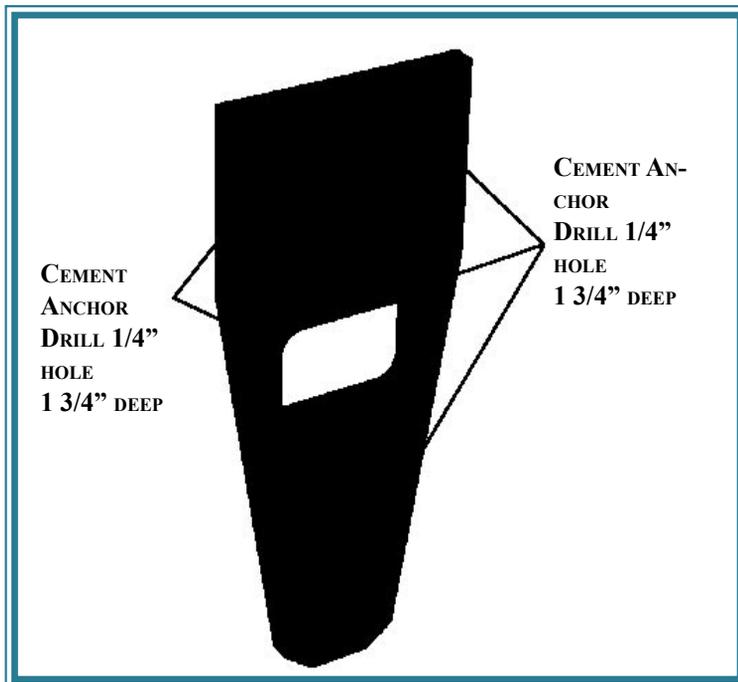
MOUNTING LOCATIONS FOR A CONCRETE WALL.
